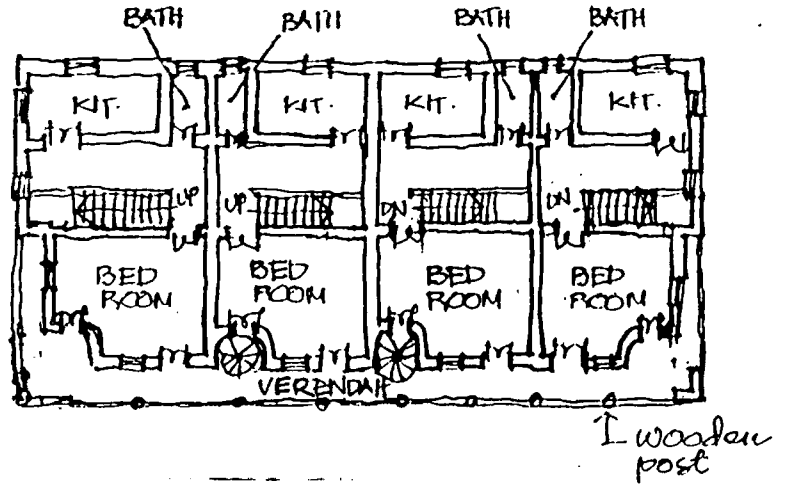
First floor plan, shop house, 6, Cemetery road, Khulna
